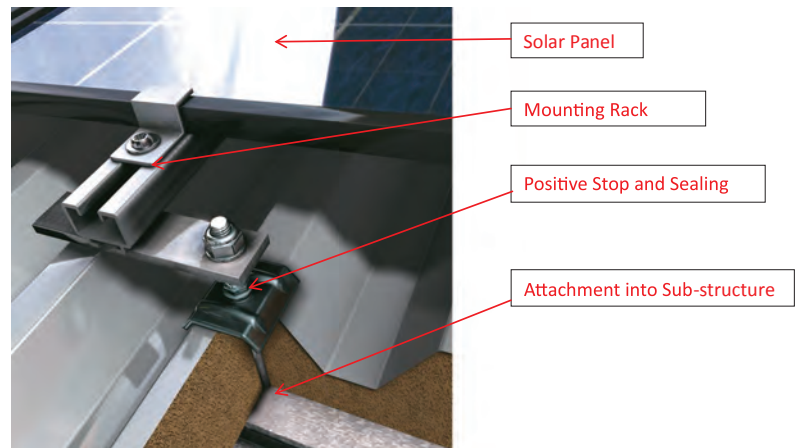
(EJOT® JA3/JZ3 Solar Fastening System Installed)
